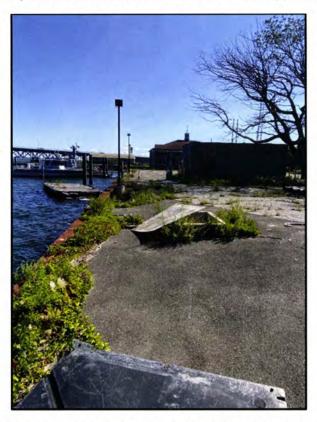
View of project site, dock and bulkhead, looking east from bulkhead Sta. 2+10.
